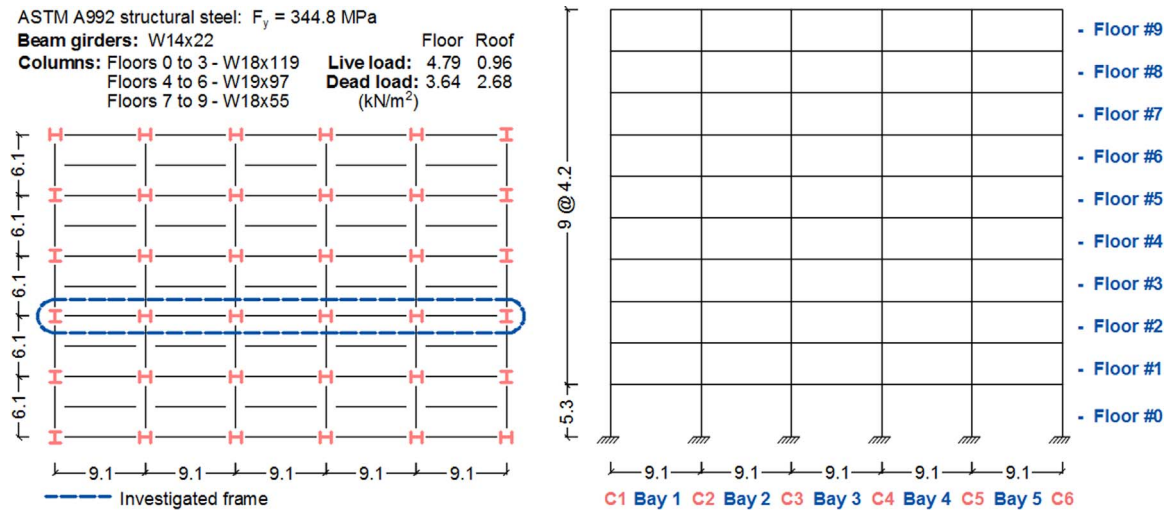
Plan layout, elevation and structural member details of the investigated frame [18]. Frame dimension units are in meters.
